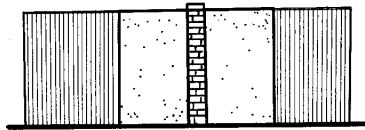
RESIDENTIAL VIEW WALLS AND FENCES
